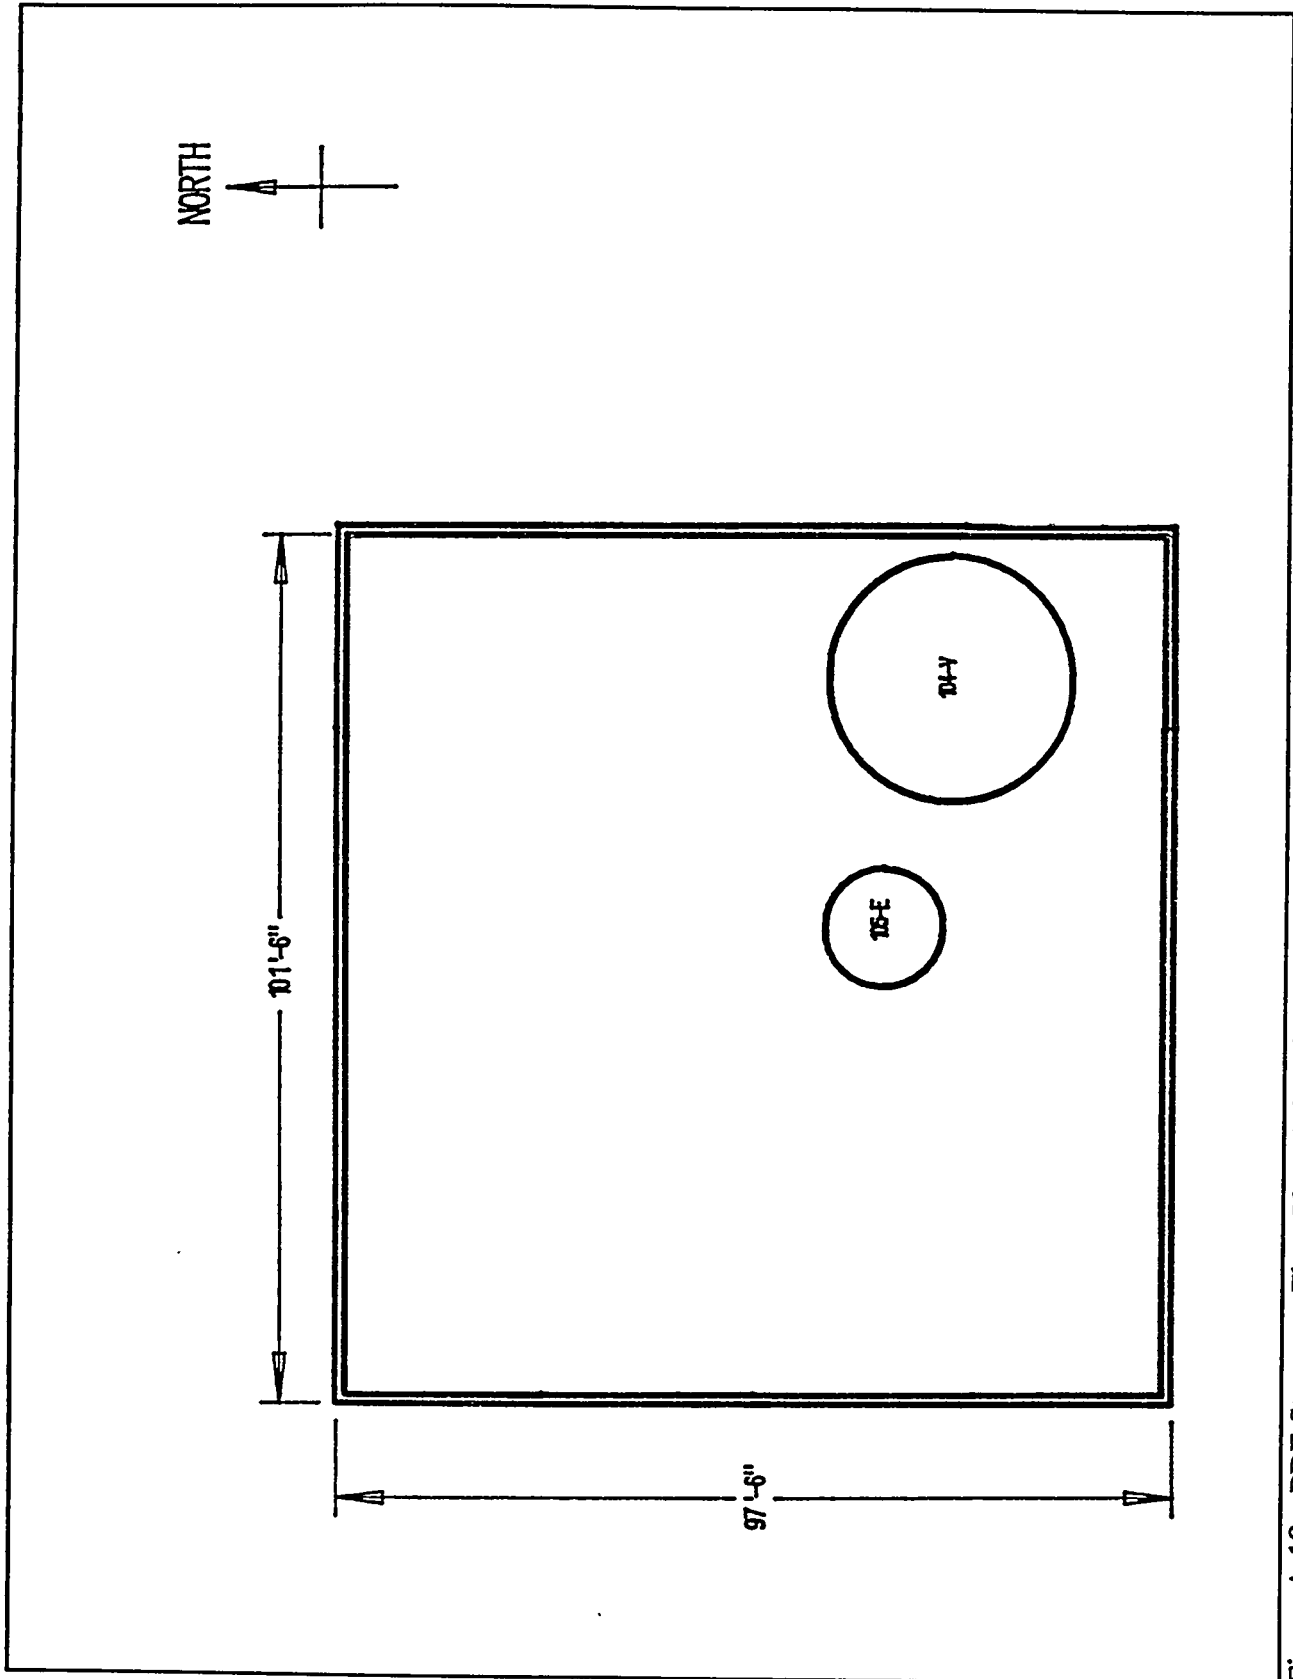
PDF Structure Floor Plan (Elevation 182'-6")
